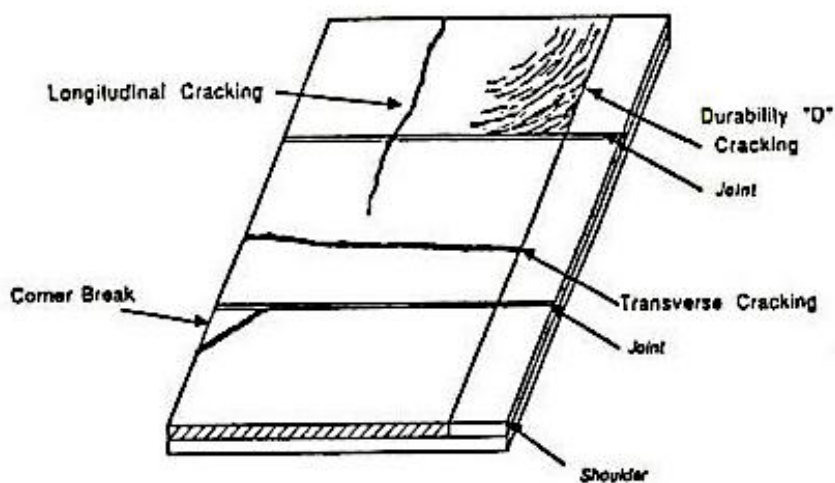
Sketches of Typical Distresses in Jointed PCC Pavements.
